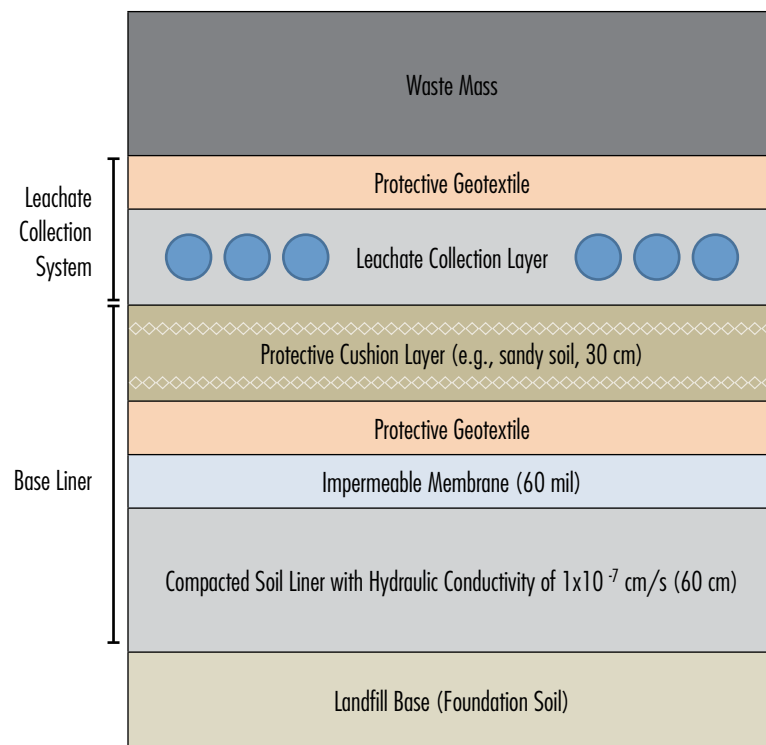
Cross-Section of a Typical Base Liner and Leachate Collection System (Option B) for a Class 1 Landfill (Note: not to scale)
